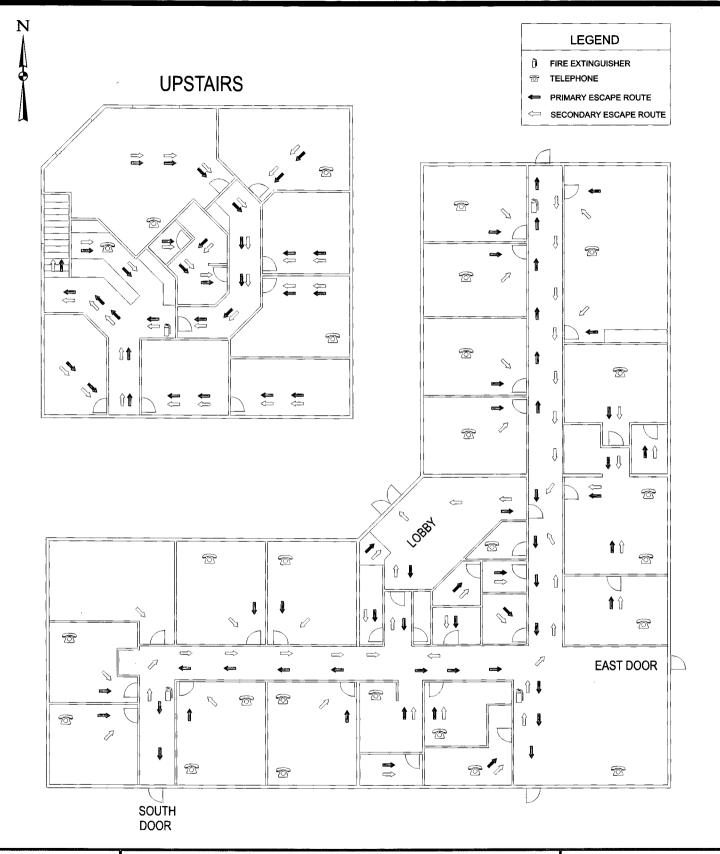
OFFICE TRAILER EMERGENCY EQUIPMENT & ESCAPE ROUTE
